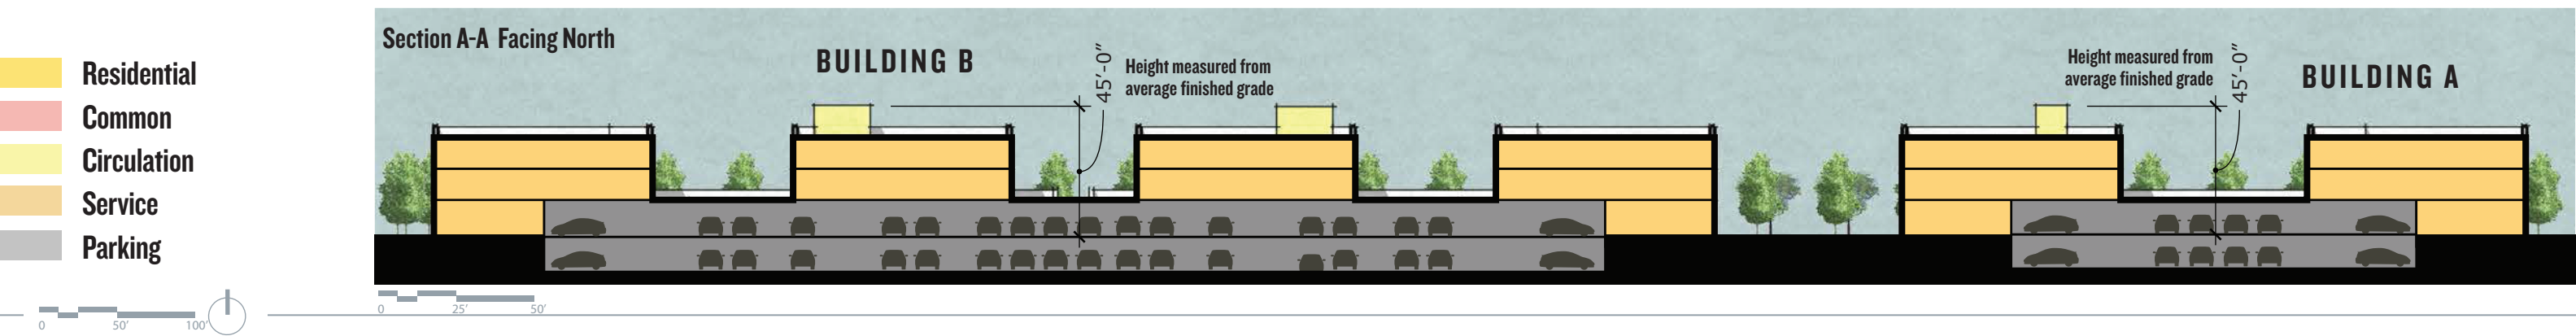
San Bruno Avenue - High Density Residential Schematic Building Prototype, Plan and Section - Alternative I
